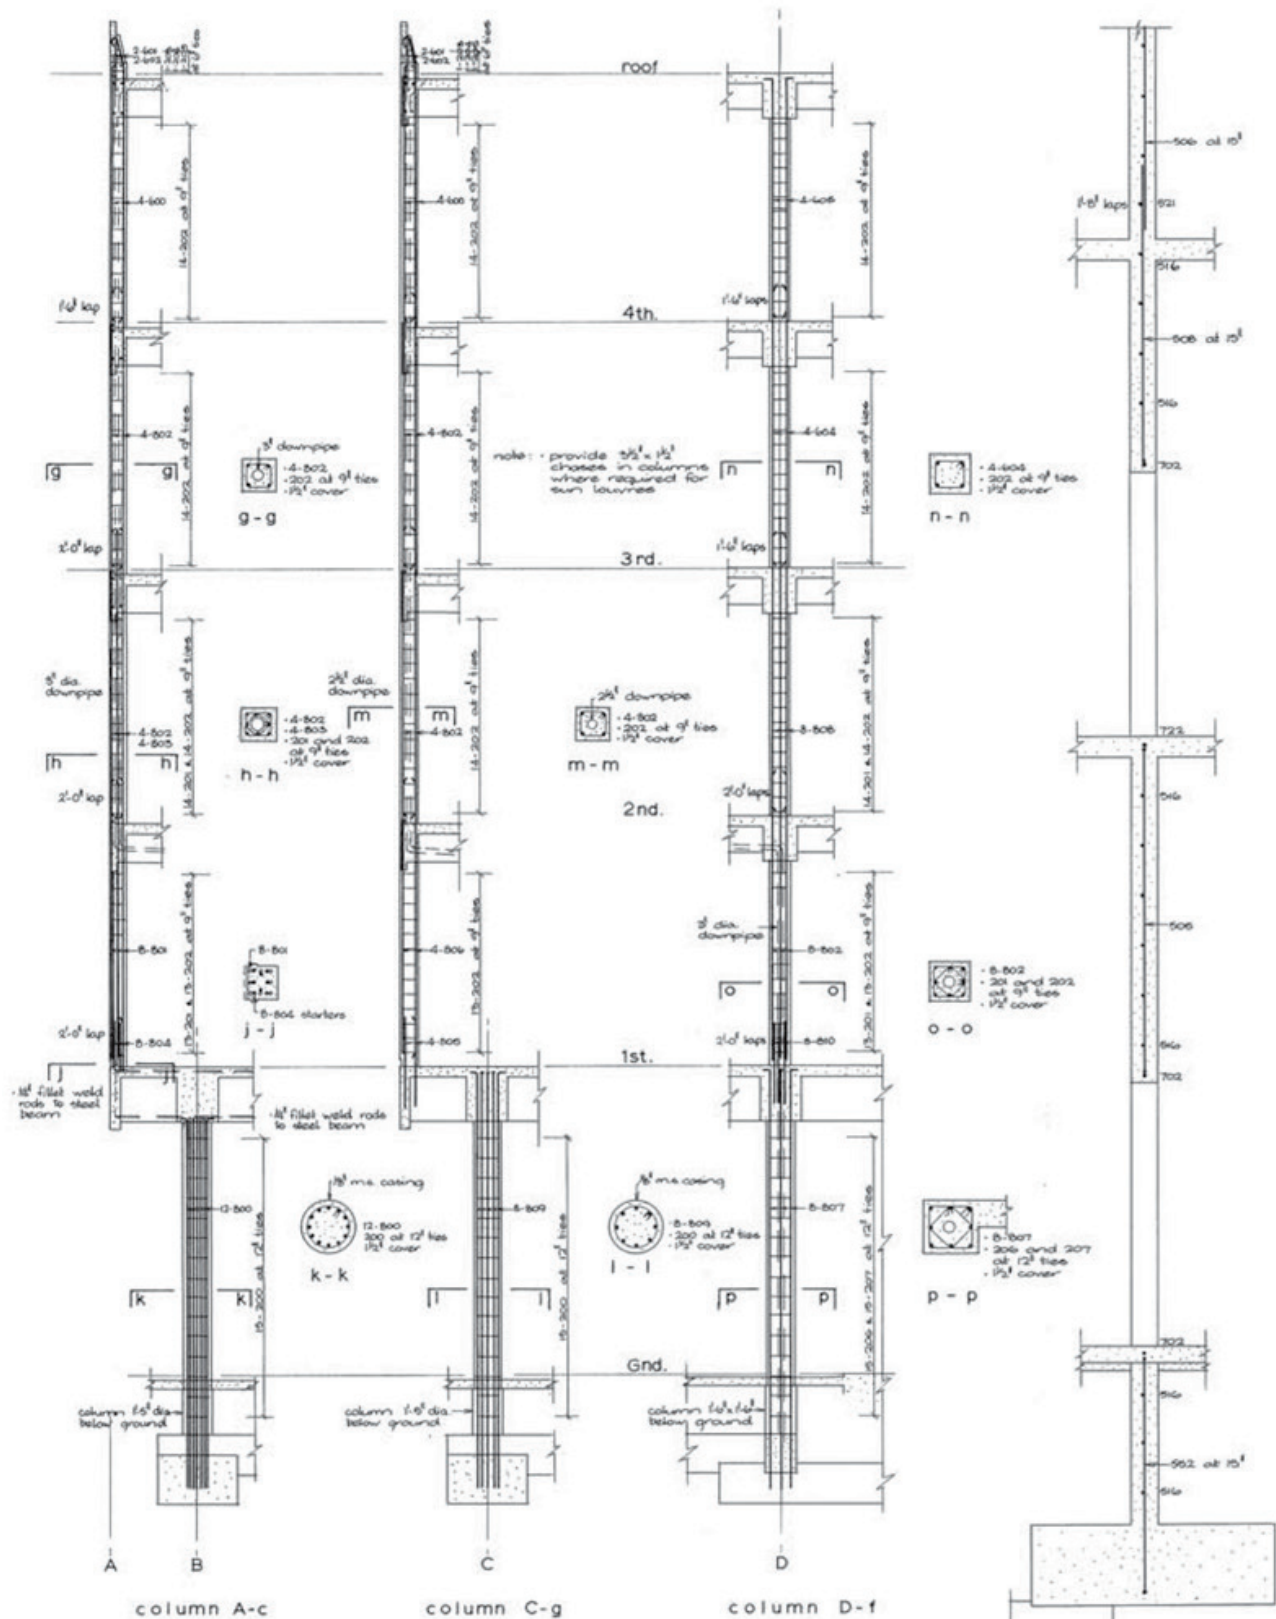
Building drawing showing column and wall dimensions and reinforcement details (Beca, 2011).
